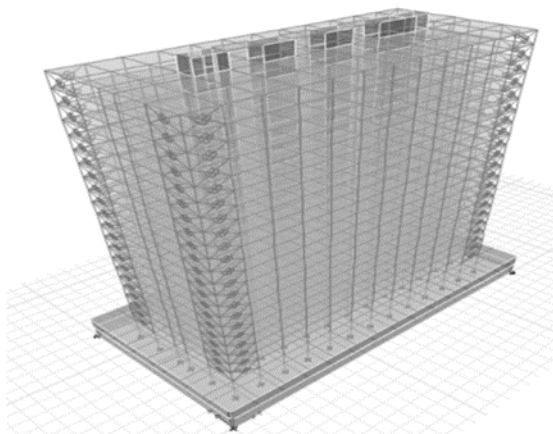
Model with FVD for all storeys at Exterior Corners Isometric View.
